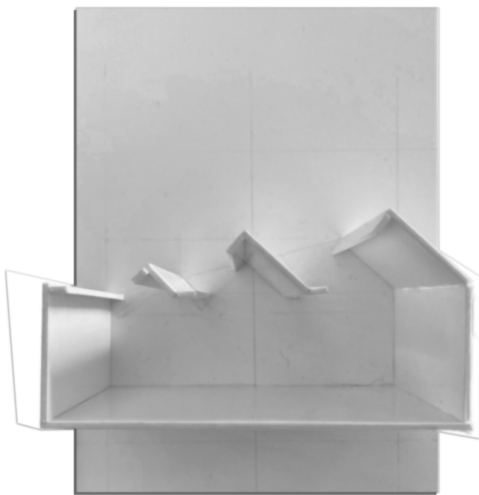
Sectional maquette exploring a sloping saw-tooth roof
